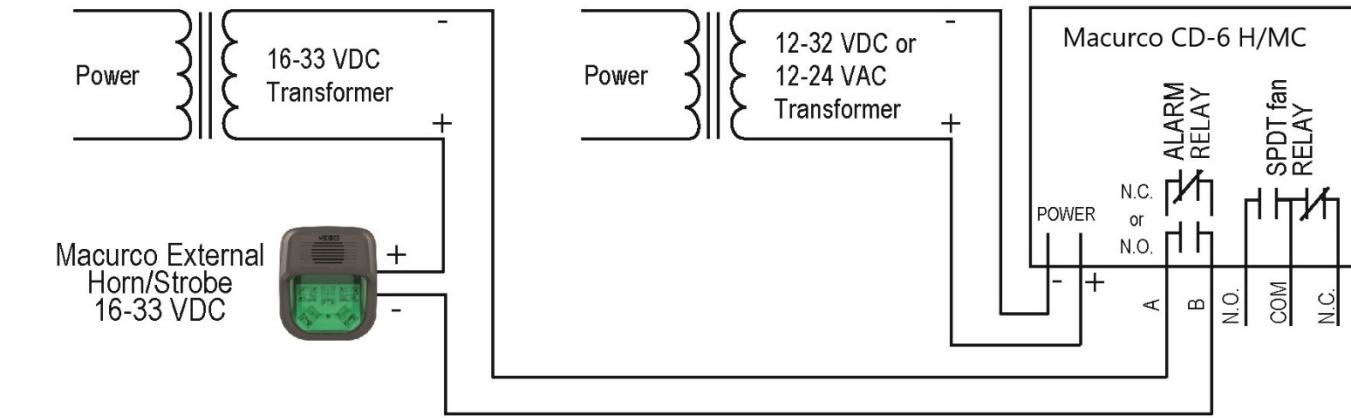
6-Series Horn & Strobe Combo Wiring
